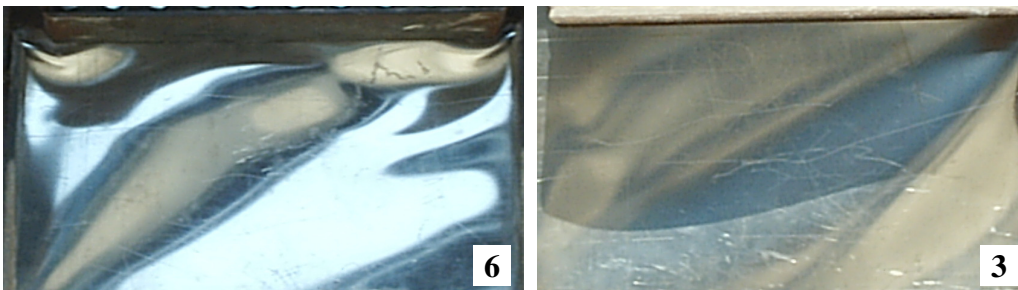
Deformed shapes of sub-panels (with their own number) belonging to the shear wall located at the back side of the RC structure (continues)
